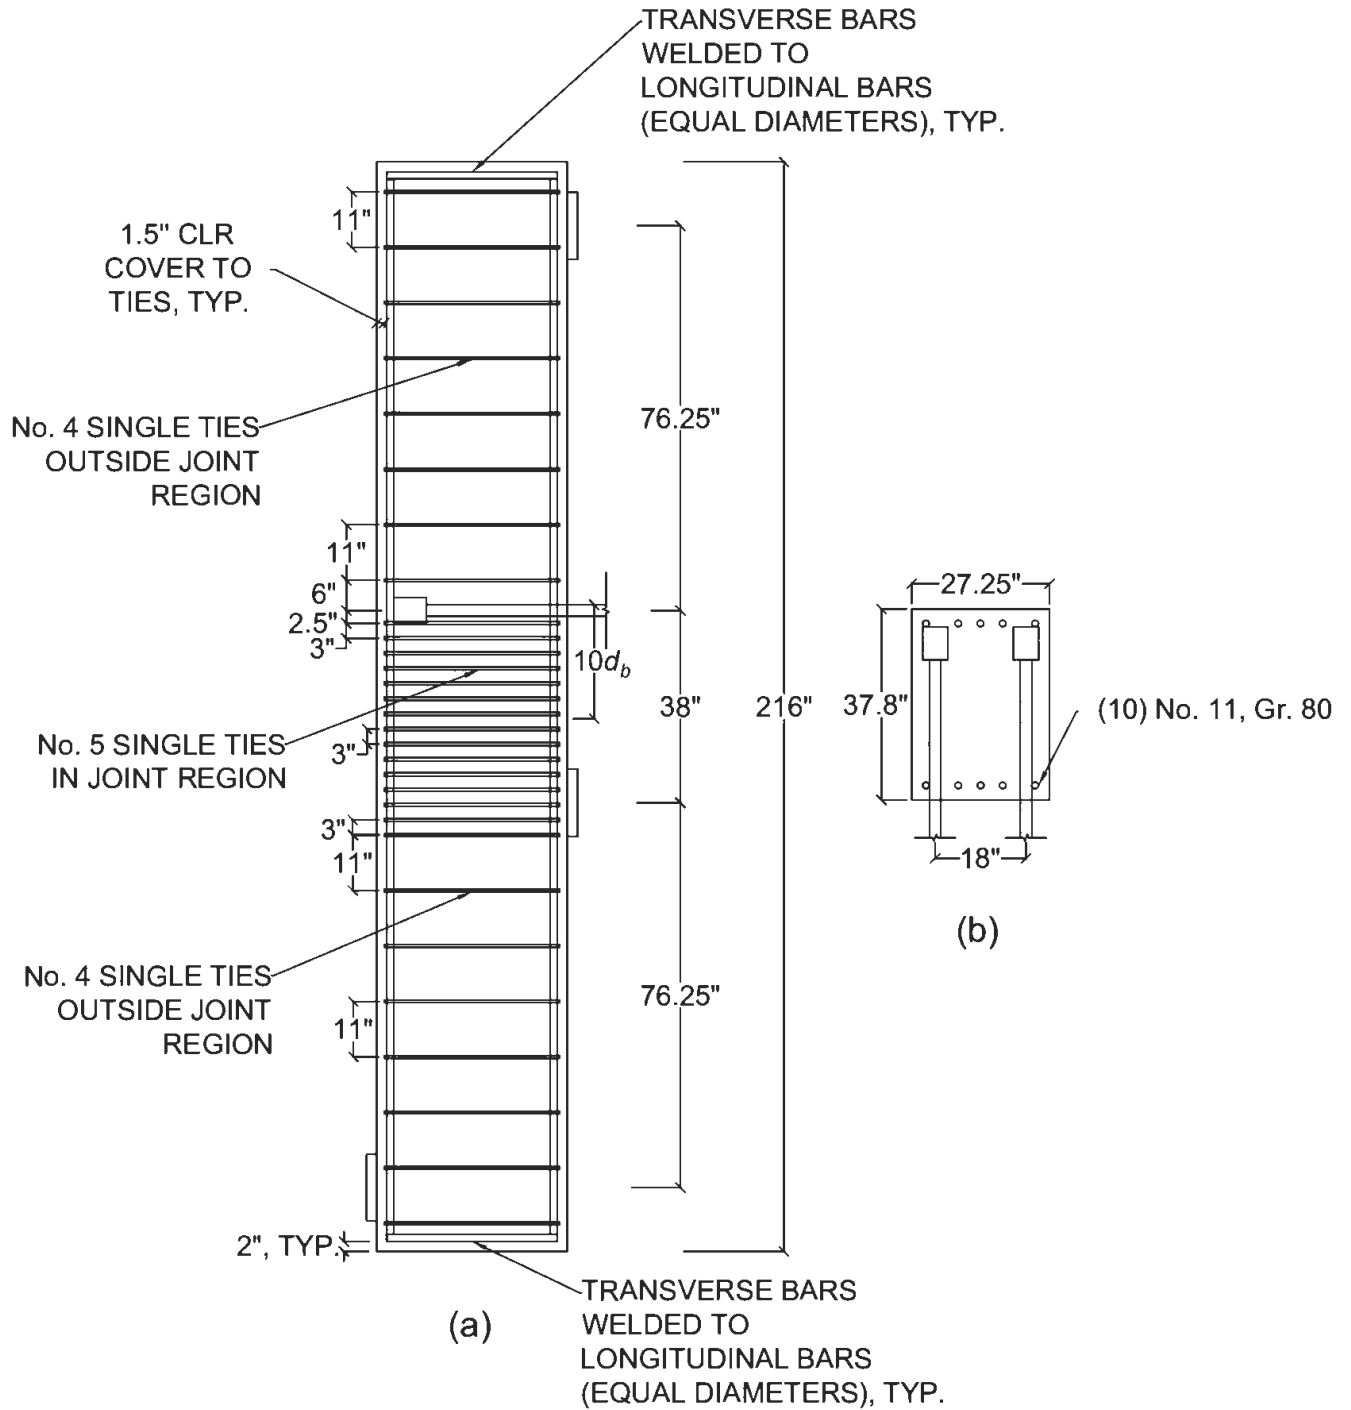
Details of reinforcement layout for No. 18 headed bar specimen 18-2: (a) elevation, (b) cross-section
